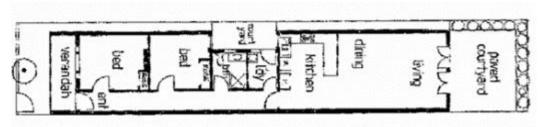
Floorplan of No. 32 Cooke St (source: realestate.com.au)
